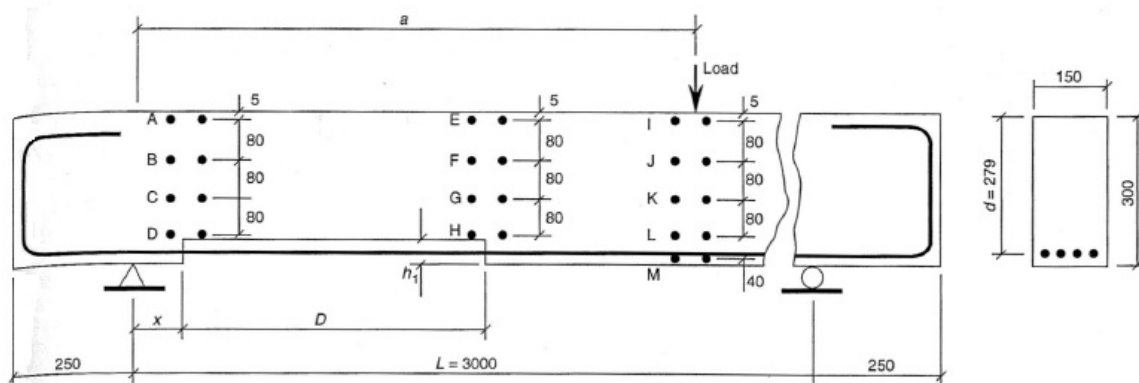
Details of Large-scale Test Specimens (Raouf and Lin 1997).
